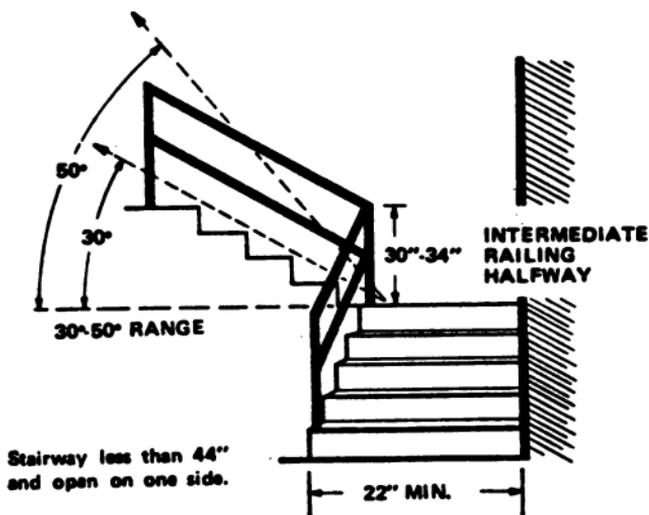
Specifications for industrial stairs. (NIOSH Health and Safety Guide for Foundries. April, 1976.)
